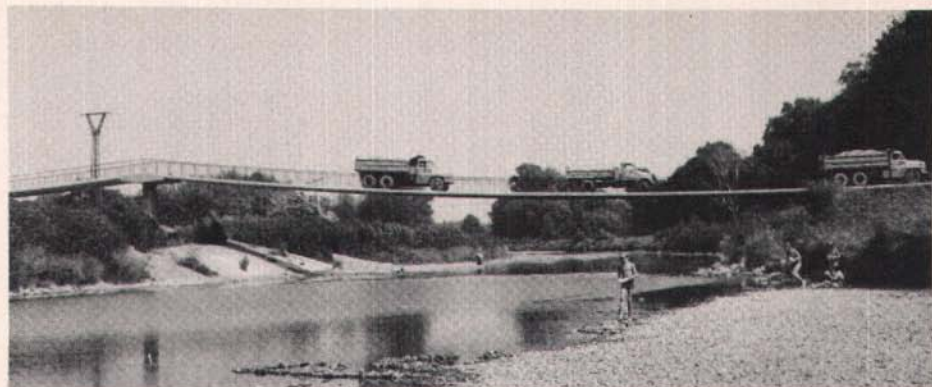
Load test using three heavy vehicles — Pedestrian bridge at Prerov.
